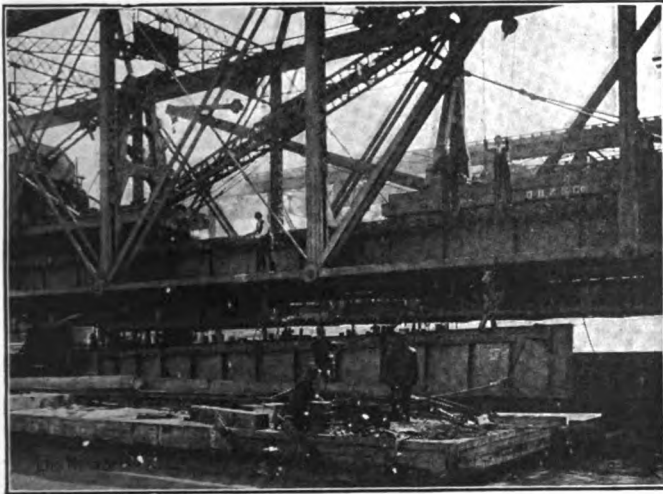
DERRICK CAR ON THE BRIDGE TAKING A FALSEWORK GIRDER FROM A BARGE AND SETTING IT ON THE PILE BENTS
